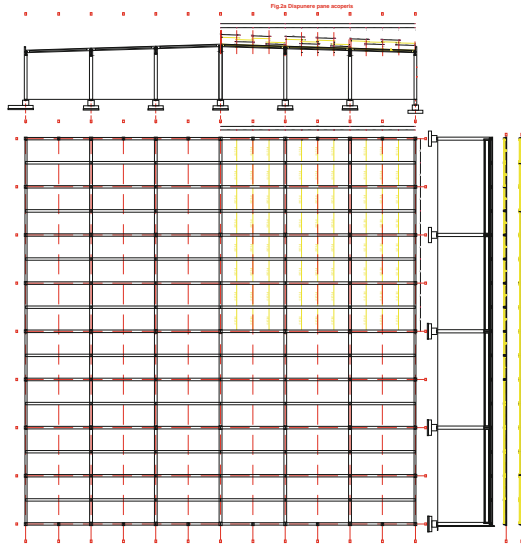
Geometry of the structure, with roof view and transversal/longitudinal frames.
